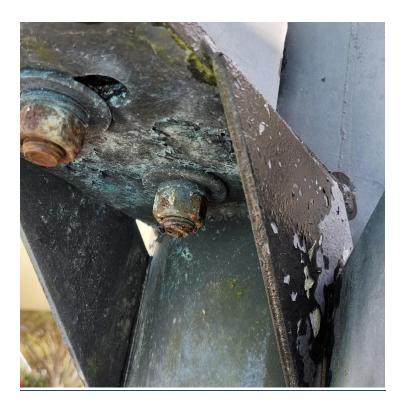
Oxidation of bolts and flaking paint at brace brackets
